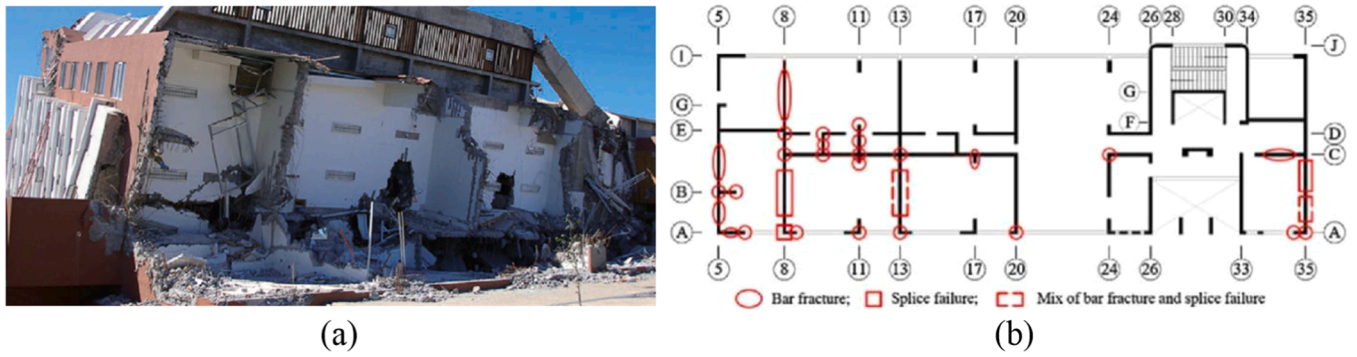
Torre Alto Rio Building: (a) photograph after collapse [3]; (b) locations of steel rupture and splice failure on first floor [4].
